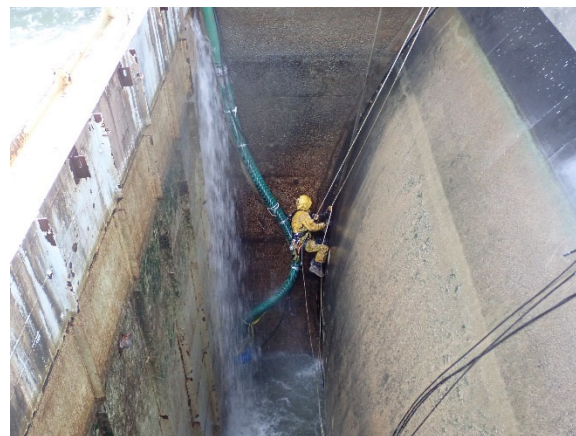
Gate inspector checking operating cables and cable connection to gate.
